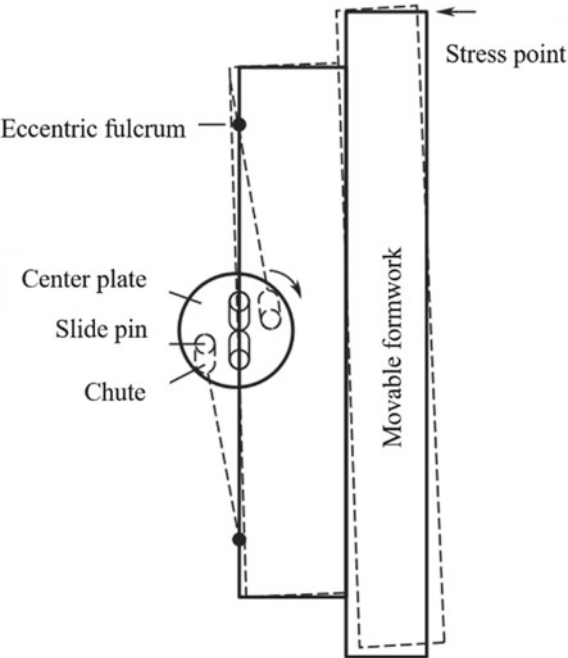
Principle of adaptive mold adjusting mechanism
